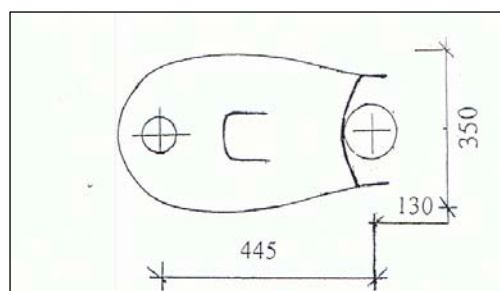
Dubbletten manufacturer's drawing of UDT footprint
